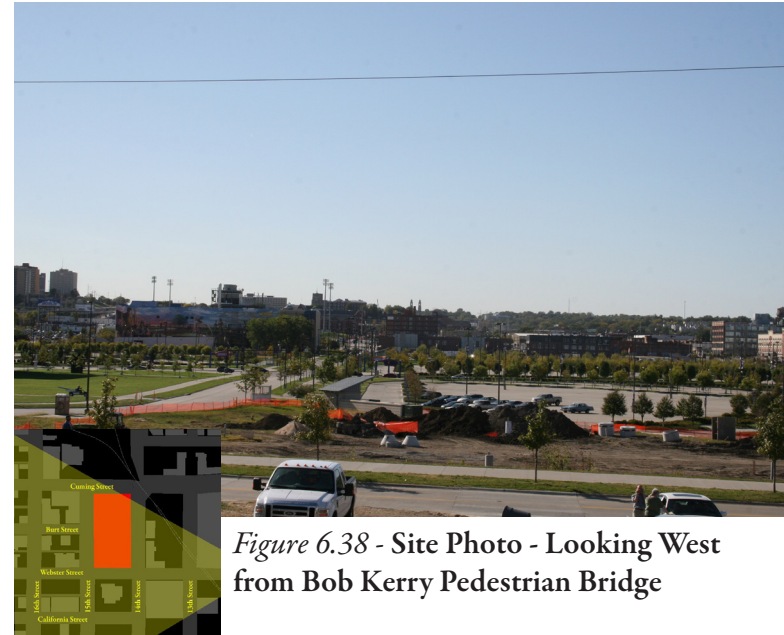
Site Photo - Looking West from Bob Kerry Pedestrian Bridge
